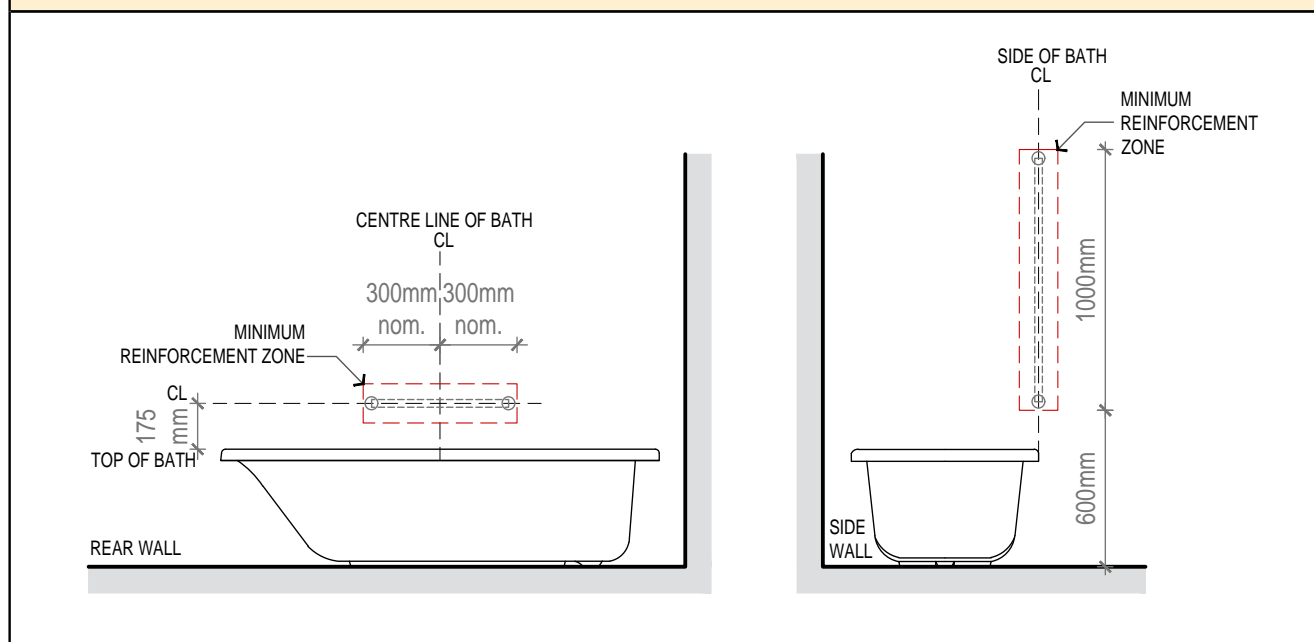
Bath wall reinforcement elevation for future grab rails
